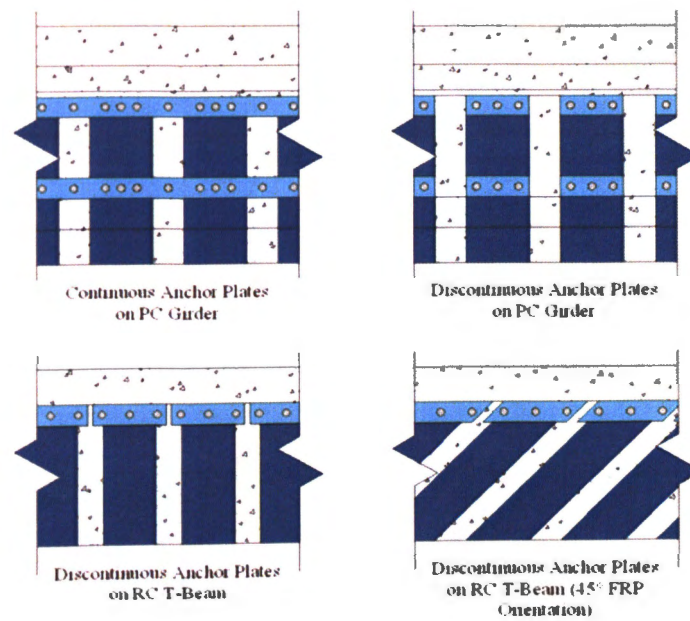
Plated Anchorage Orientations in Ortega (2009)
